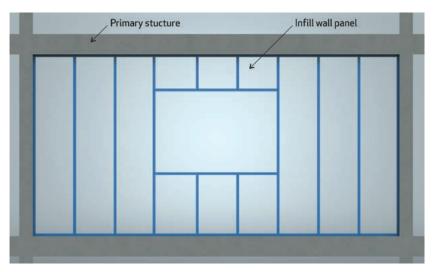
Typical infill wall panel within a steel or concrete primary structure
